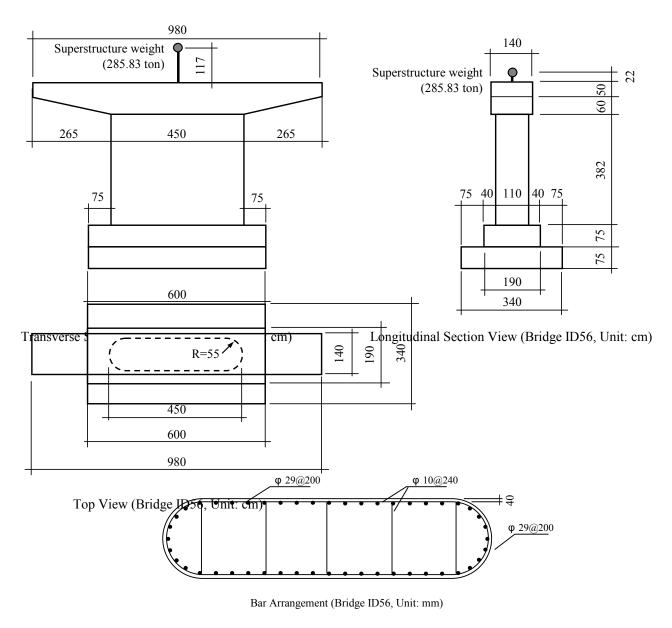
Dimension of bridge pier and bar arrangement (Bridge No.56)
